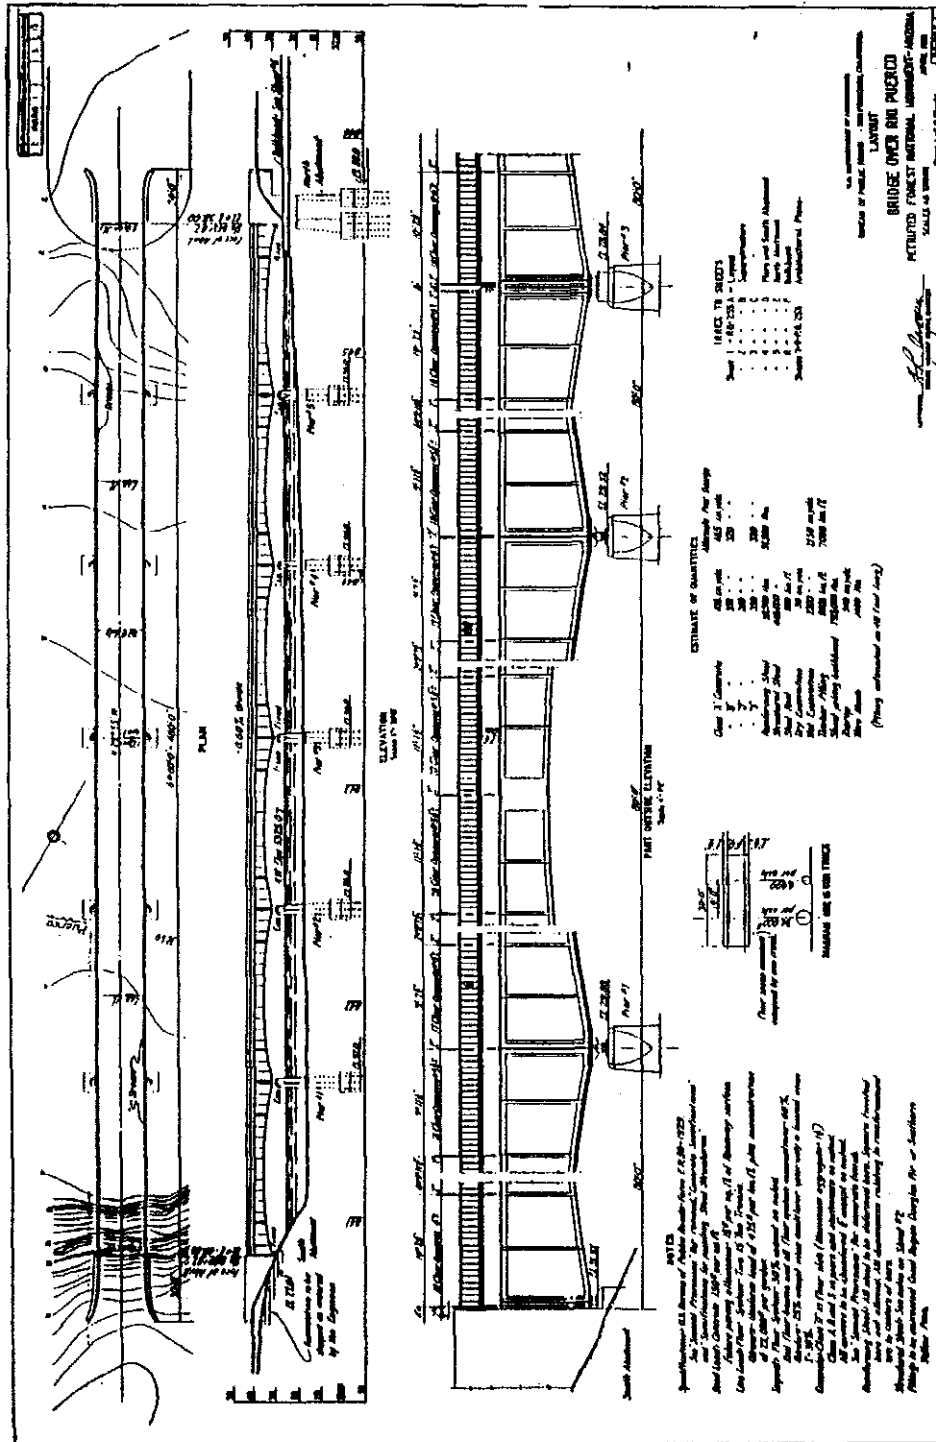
Original construction drawing, prepared by U.S. Bureau of Public Roads, April 1931. Located at Federal Highway Administration, Denver Colorado.
